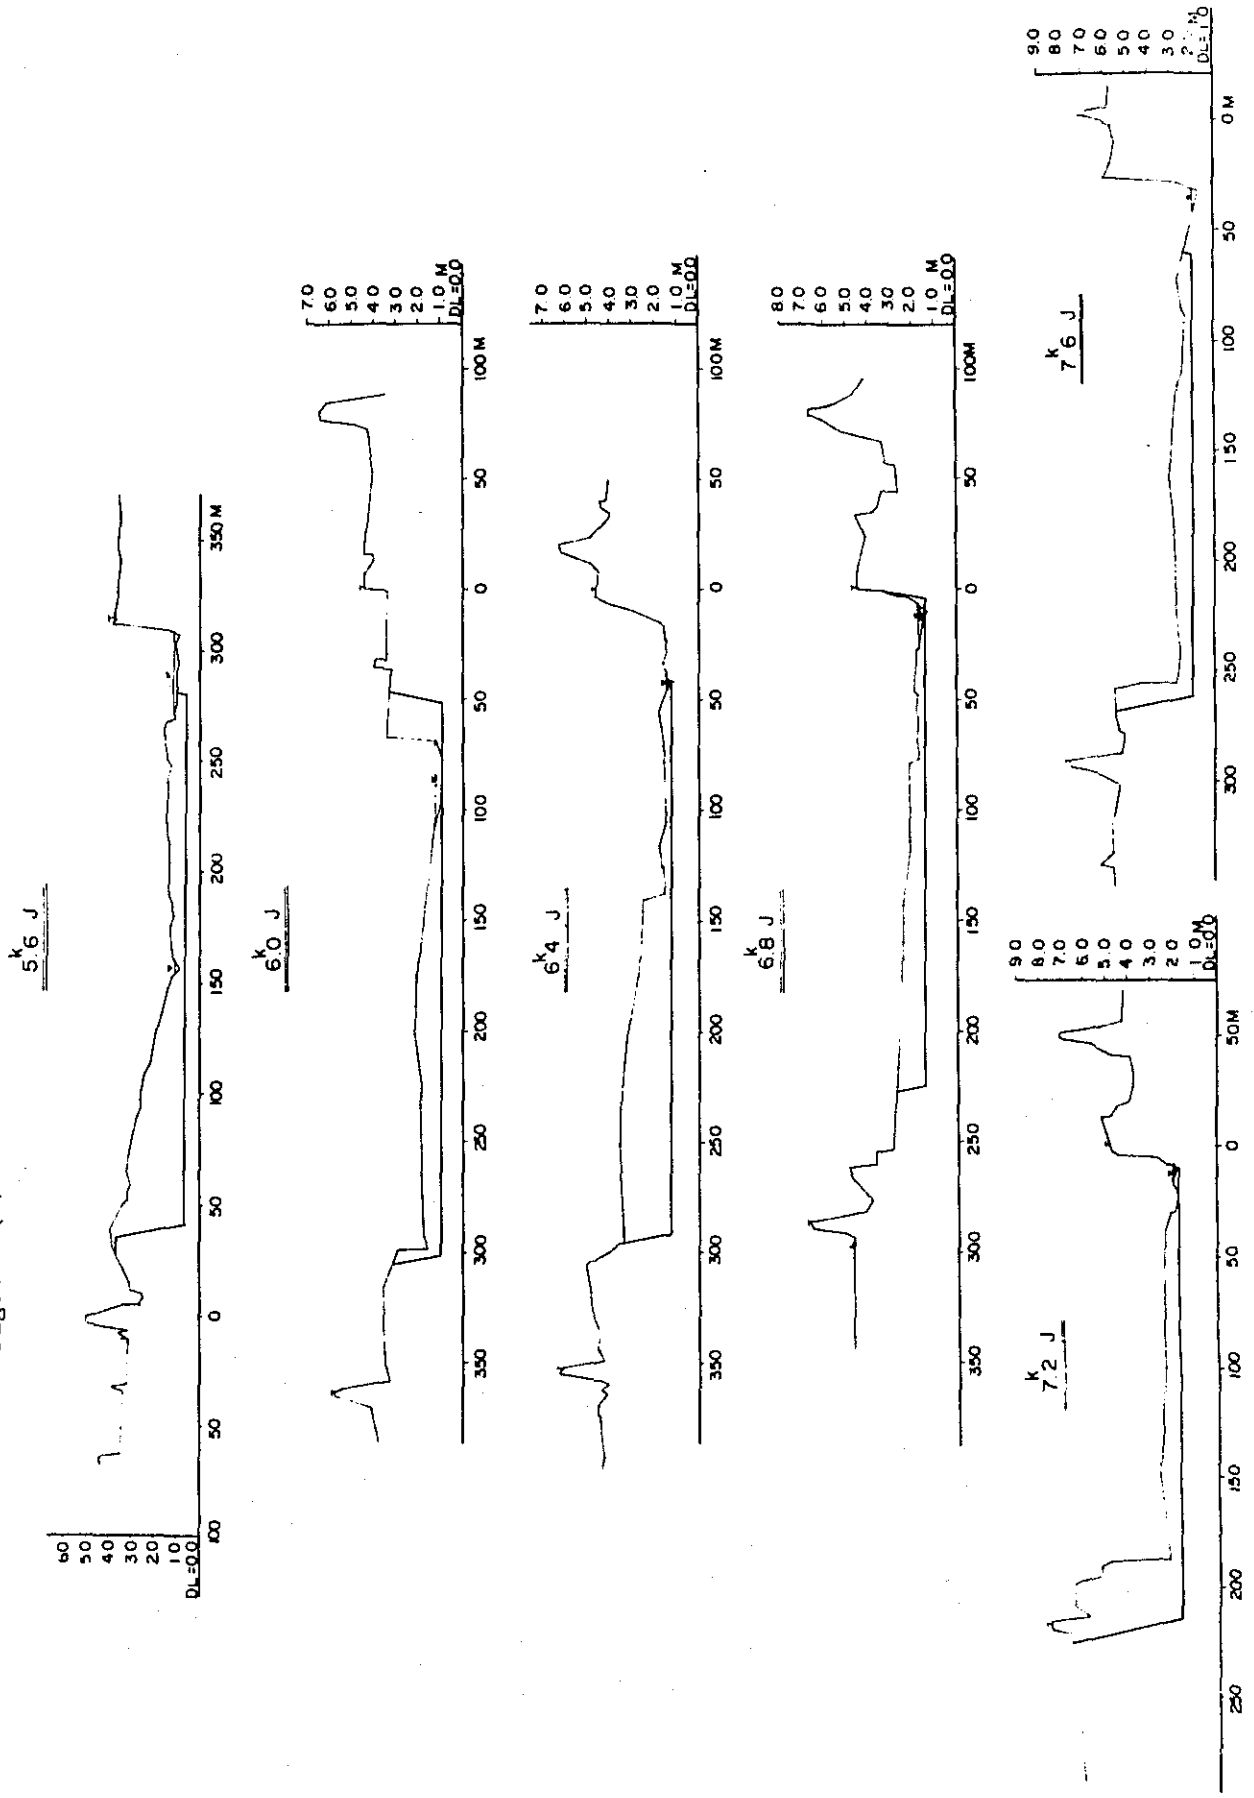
(4) PROPOSED CROSS-SECTIONS FOR URGENT PLAN
